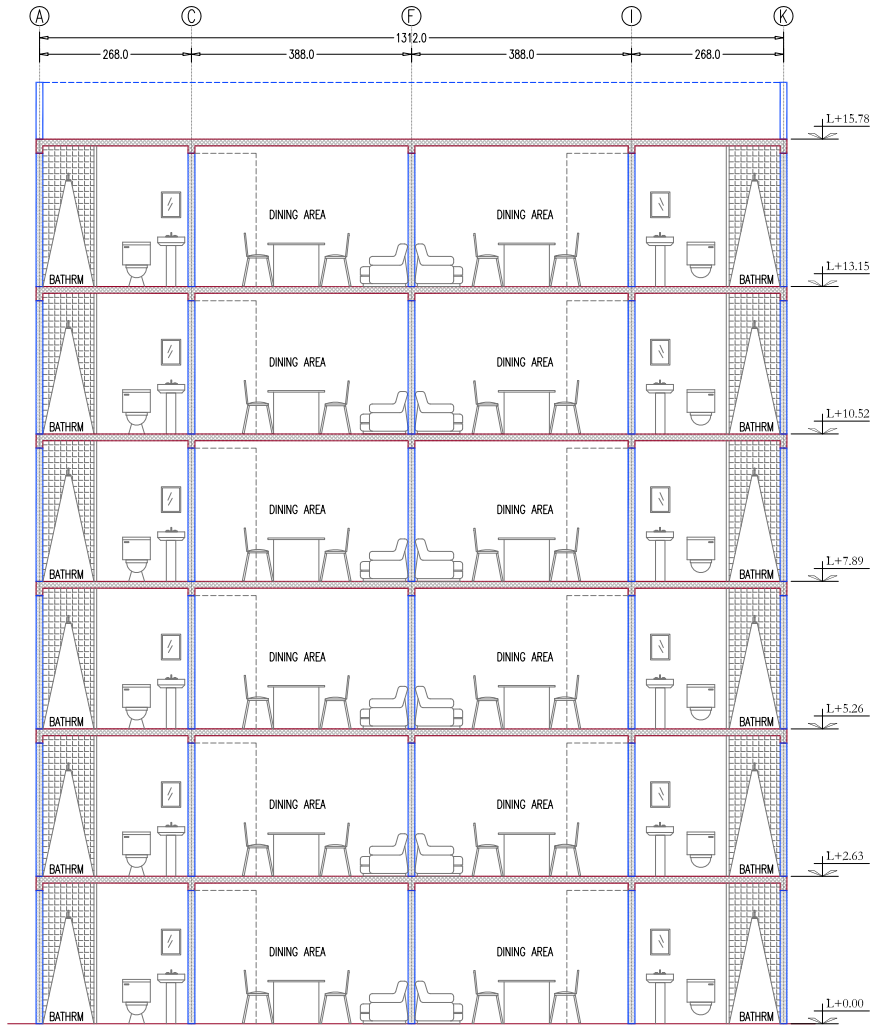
Architectural Drawing - Section A-A' (units: cm).
